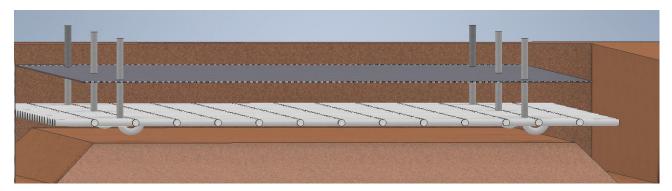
Rebar, Steel Mesh, and Anchor Bolt Placement
